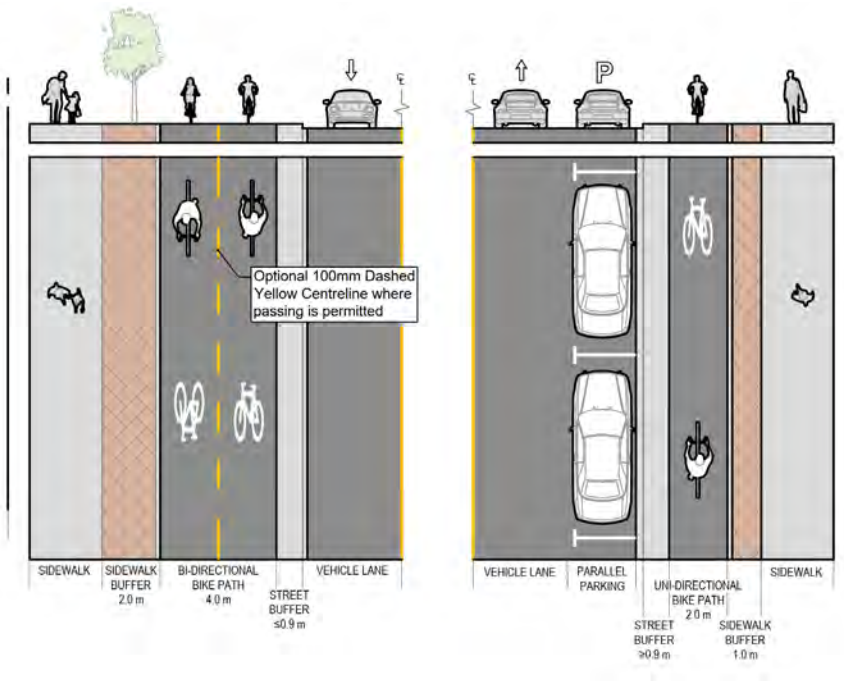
SEPARATED PATHWAY TYPICAL SECTION
